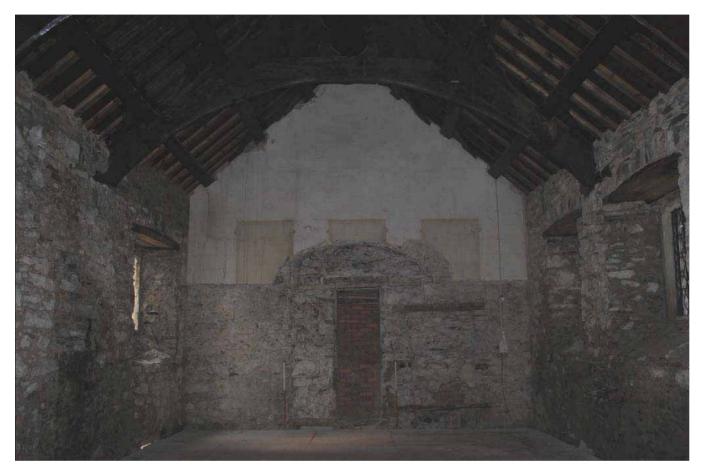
Old Grammar School internal - South-facing Internal Elevation of the School Hall. Scales 1m
